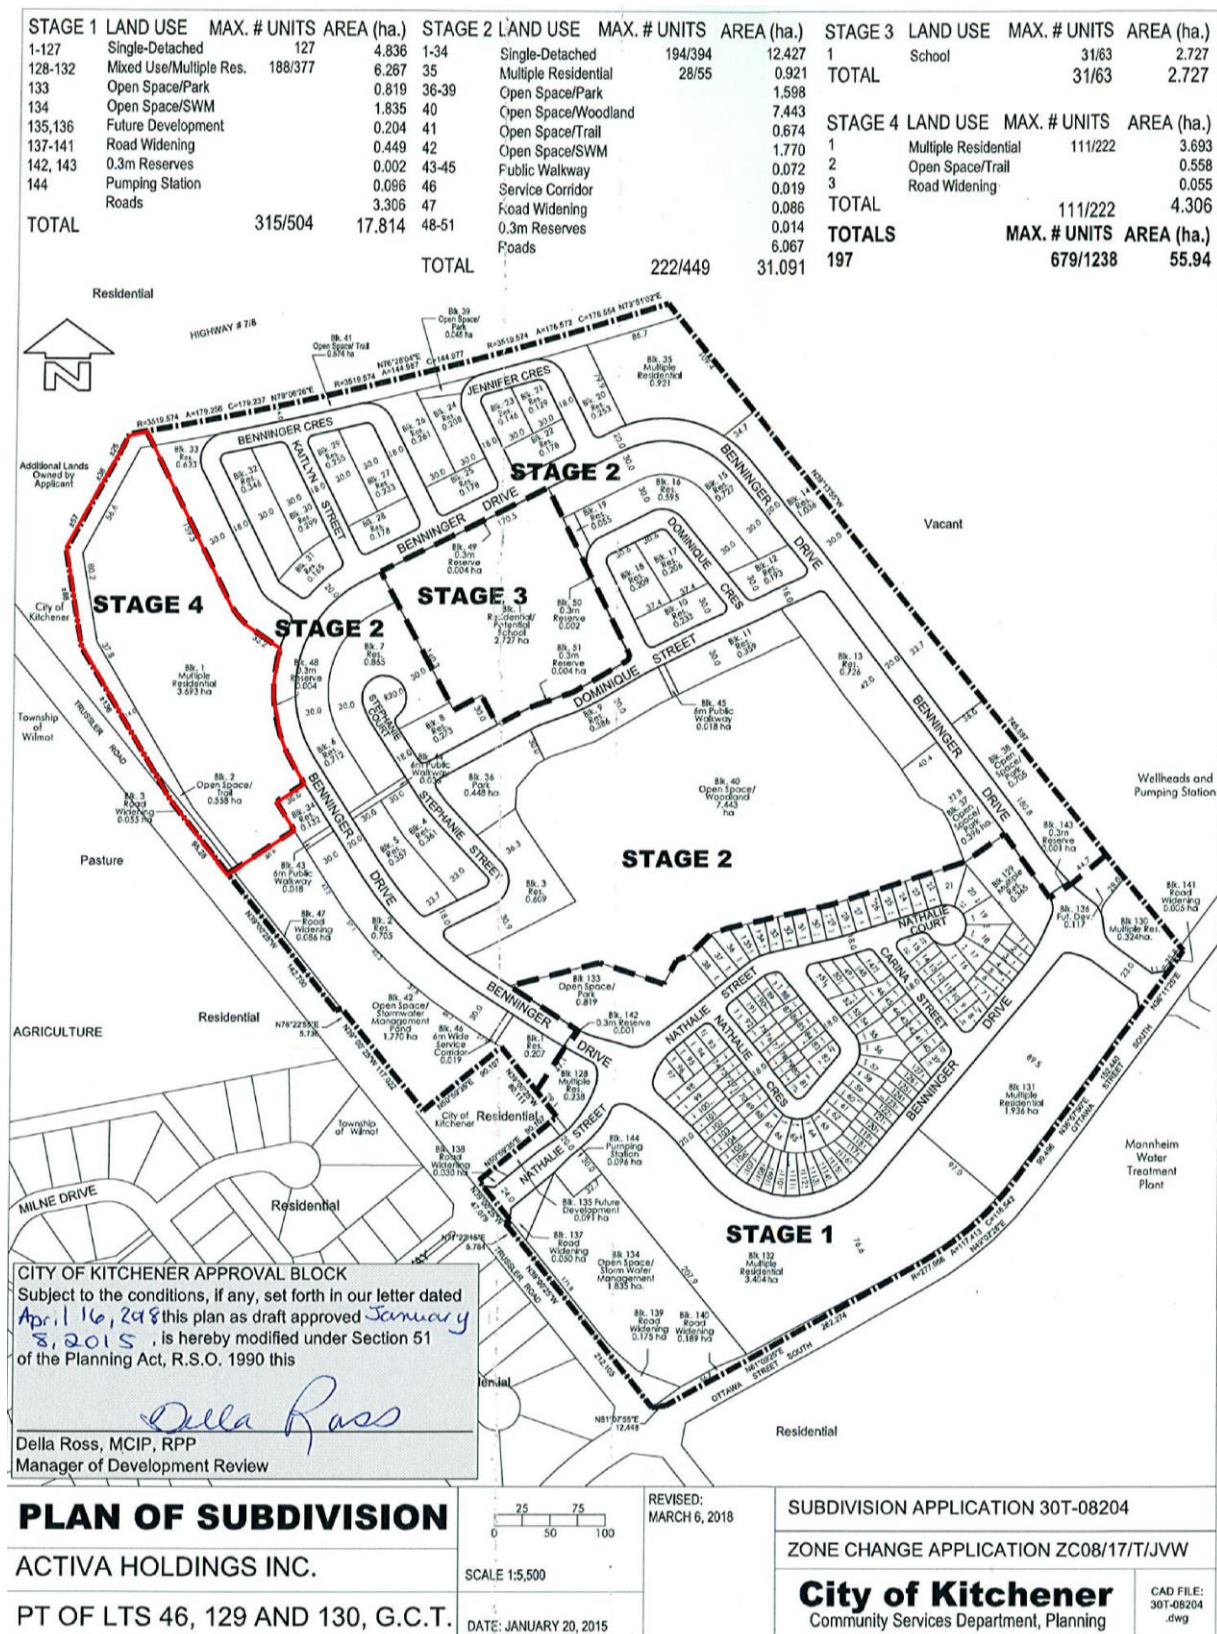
Draft Approved Plan of Subdivision 30T-08204. Stage 4 (subdivision stage affected by the subject applications) is outlined in red
